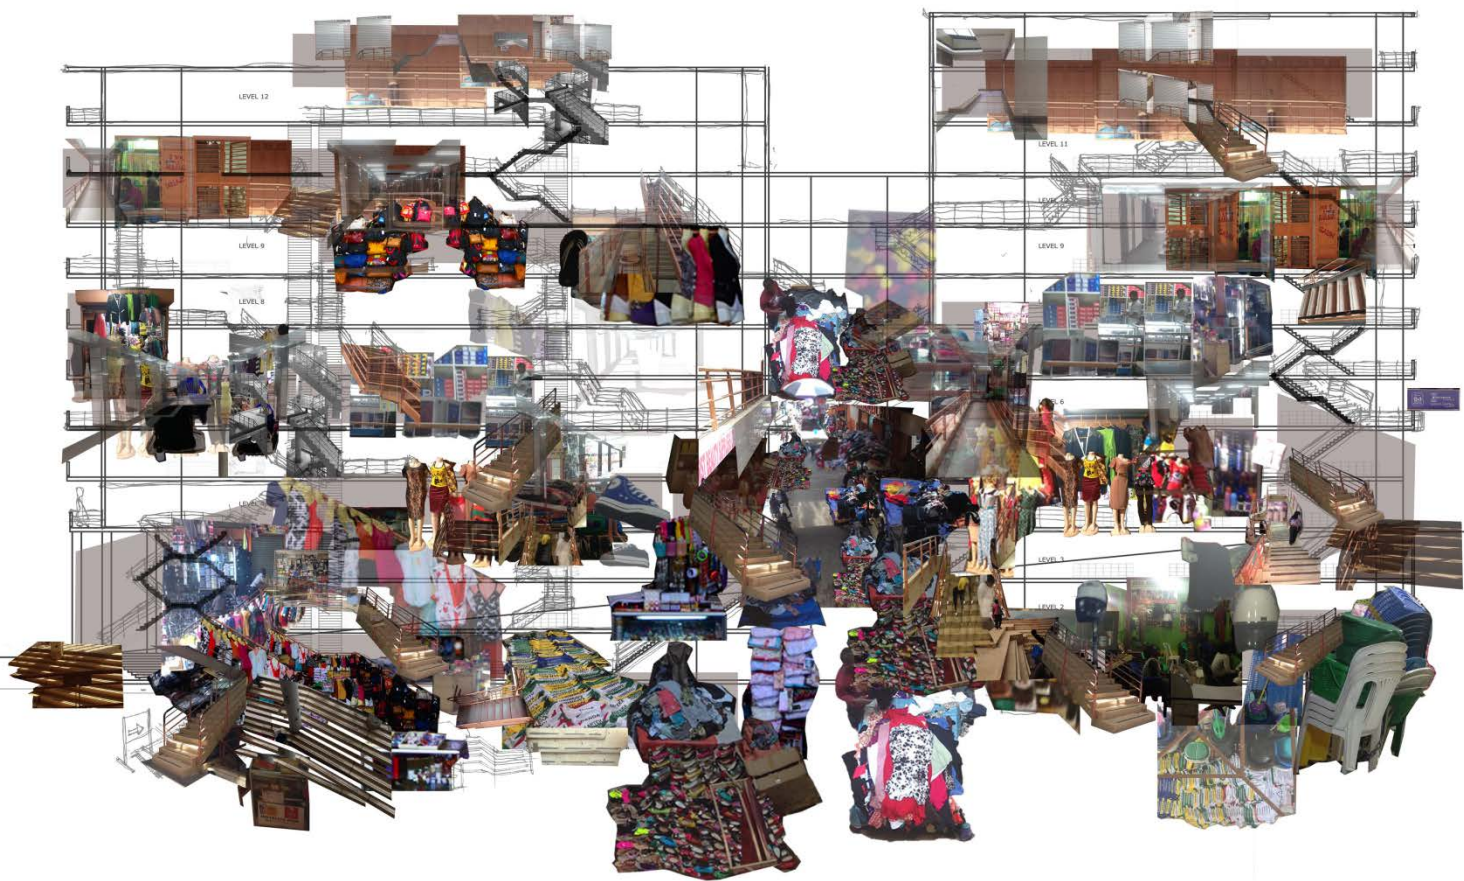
Corner House, Kampala Section collage: stairs, consumerism. Source: Author
